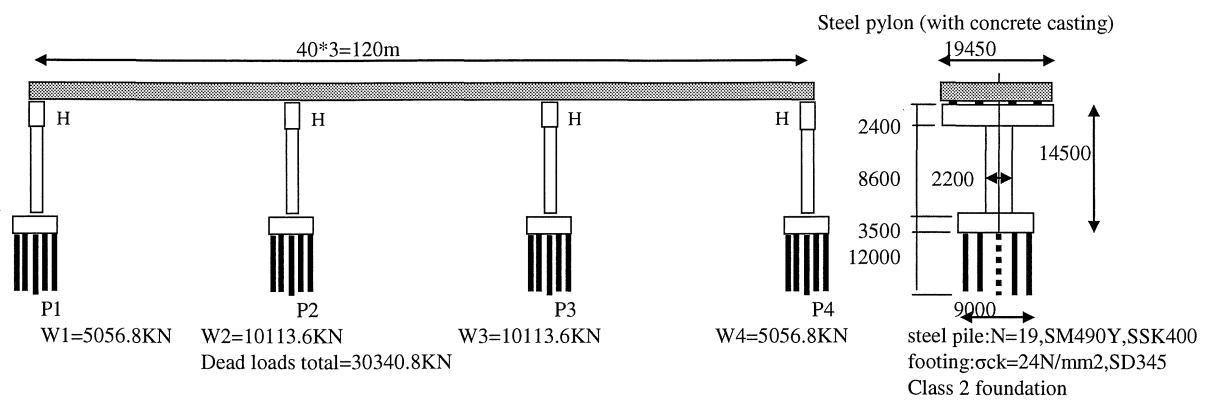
Bridge model for analysis: 3 continuous span bridge (width 19.45m)
